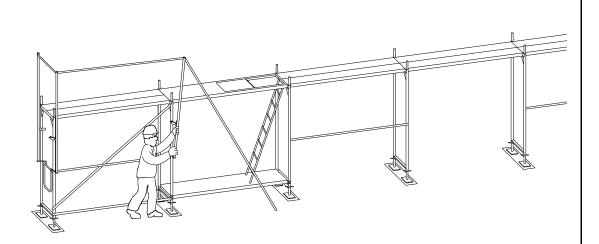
Mounting the guardrail post with other end of telescopic guardrail and another telecopic guardrail
